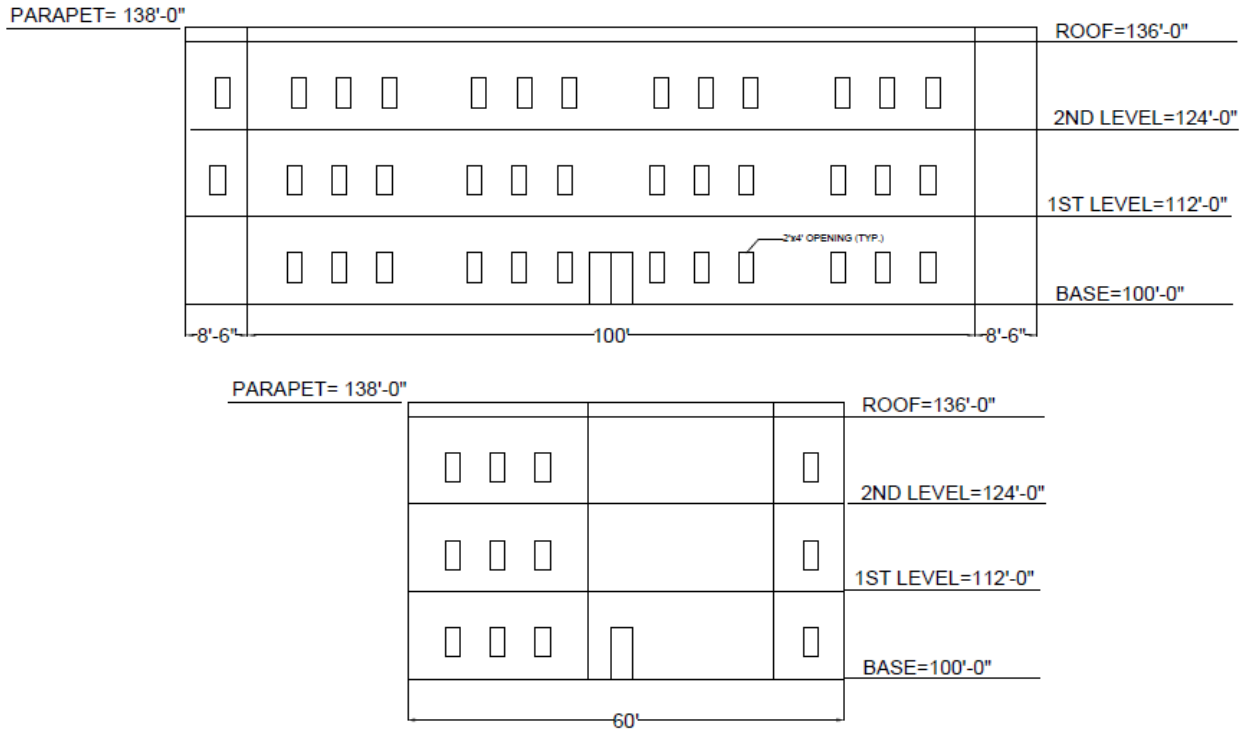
Building Elevations (Reproduced from Huenefeld, J., & Kramer, K., 2012)
